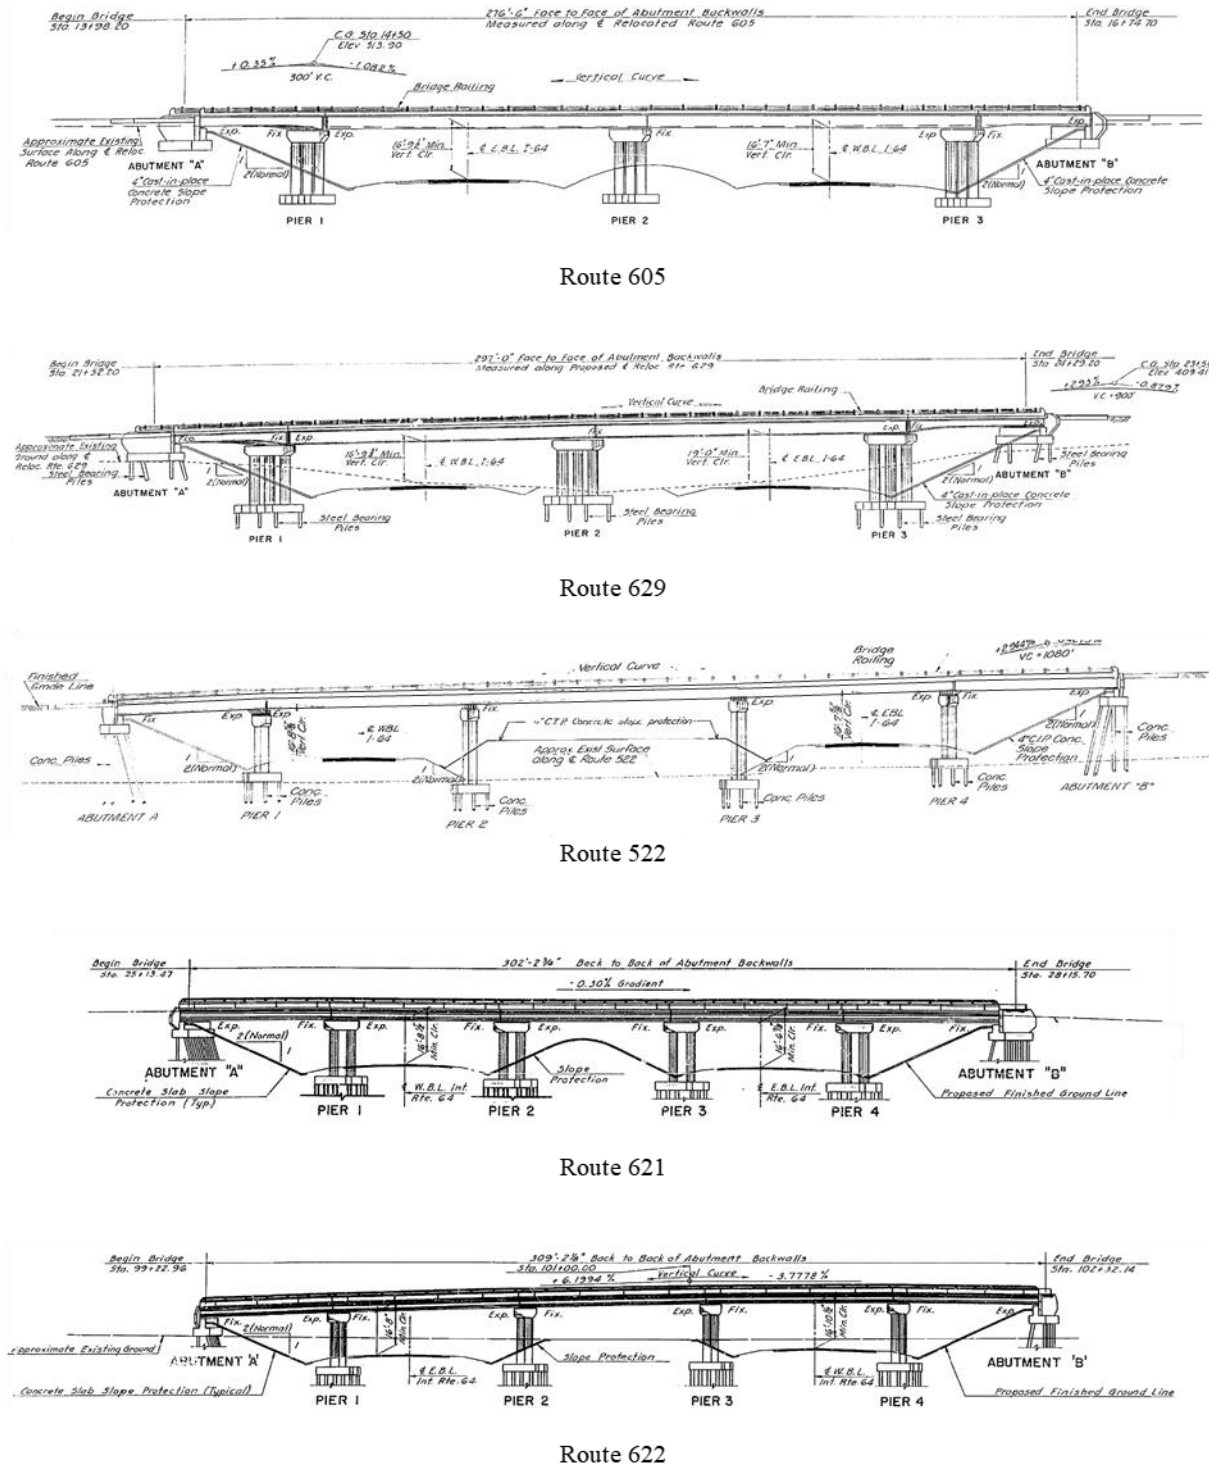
Elevation Views of the Five Structures Repaired along the I-64 Corridor in the Richmond District
